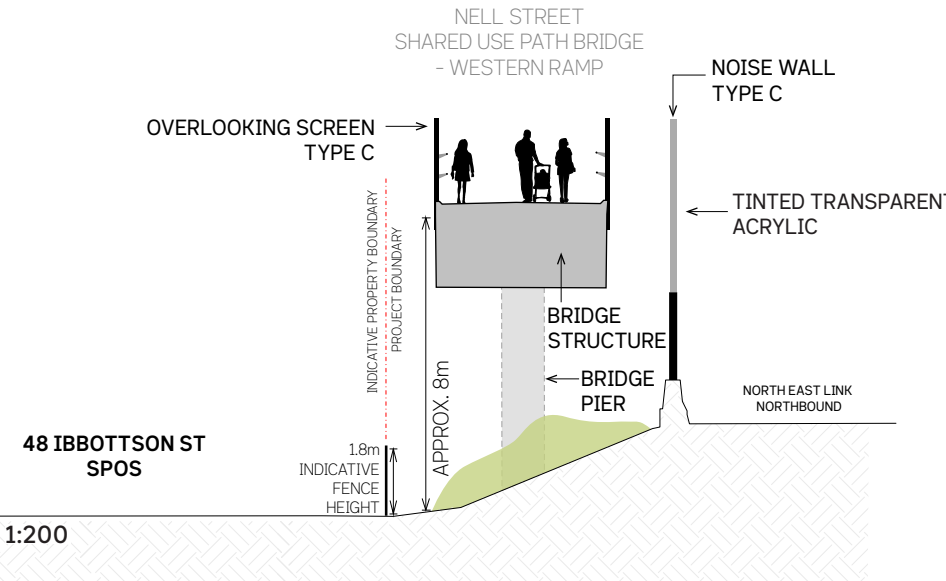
Detailed Analysis: Section C -Proposed architectural and structural elements adjacent to 48 Ibbottson Street
